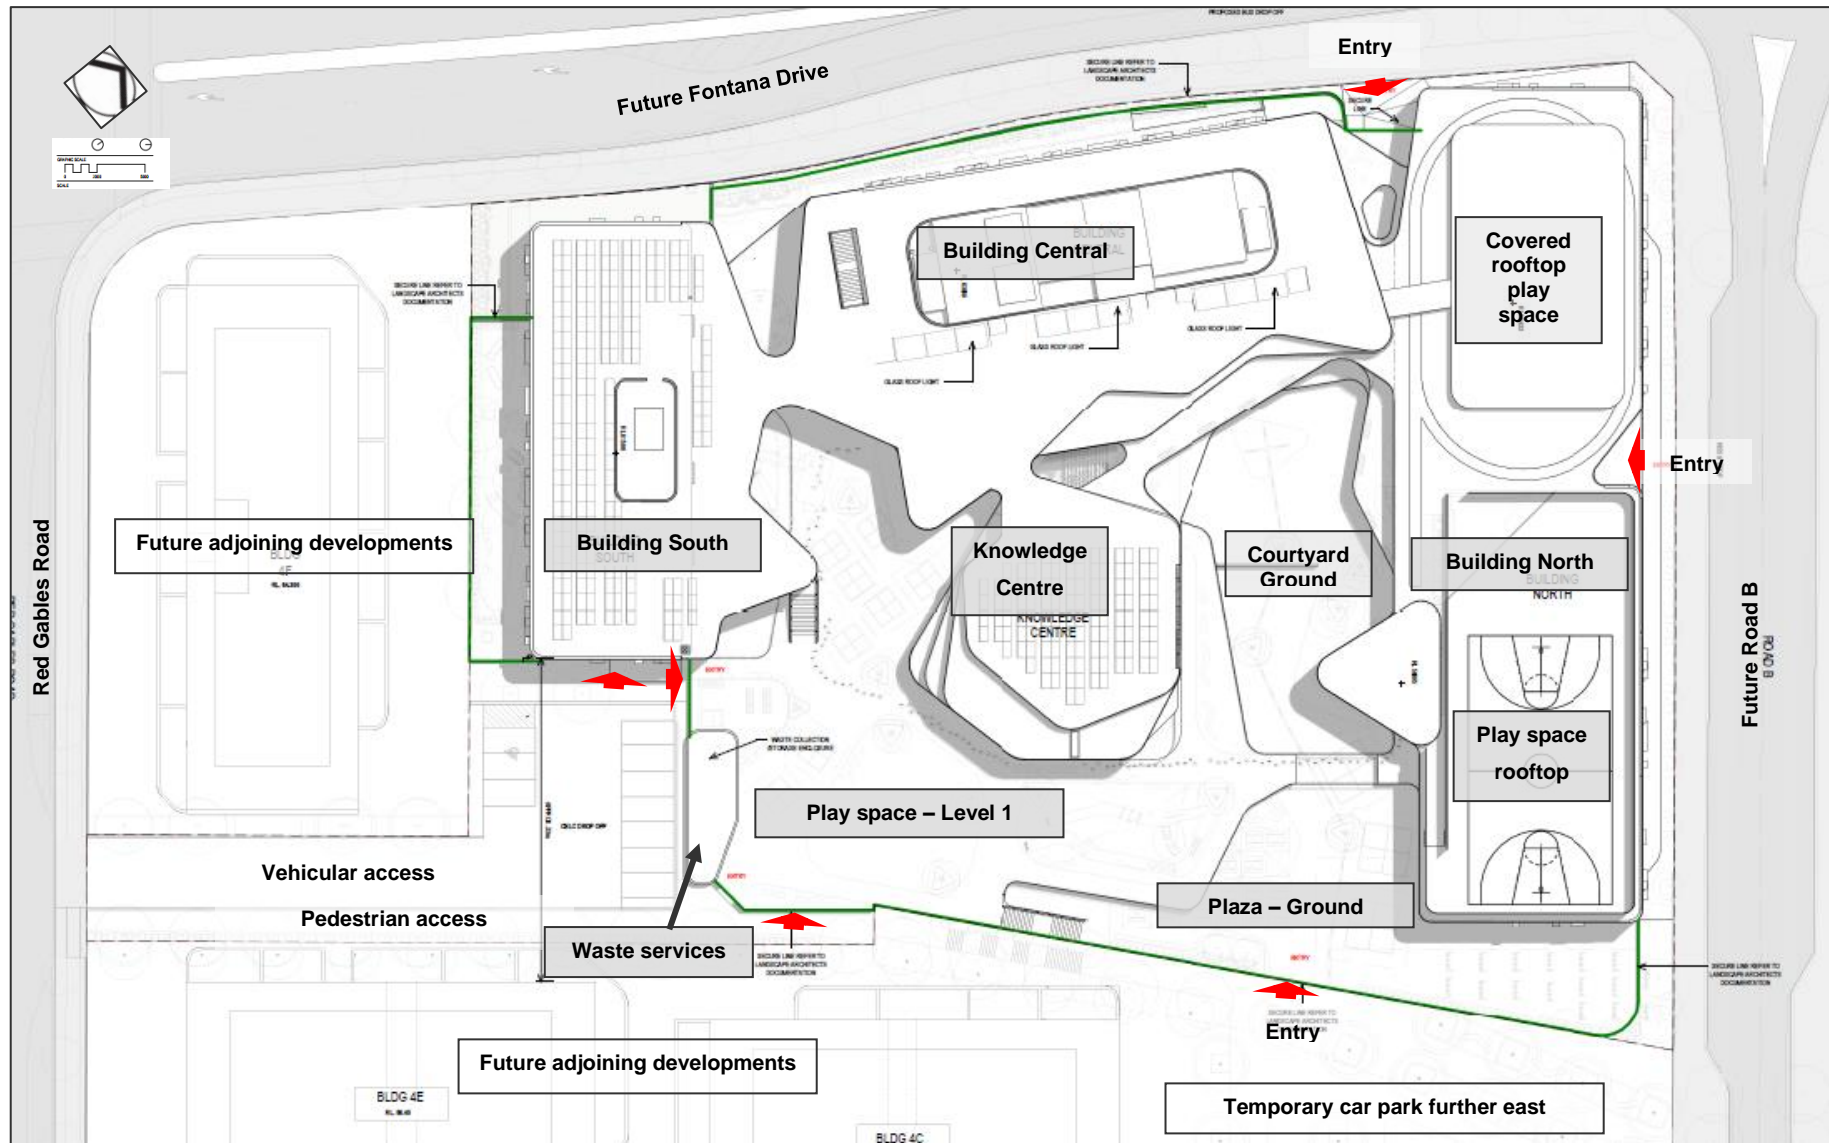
| Proposal site plan (Source: Applicant's SRtS)
